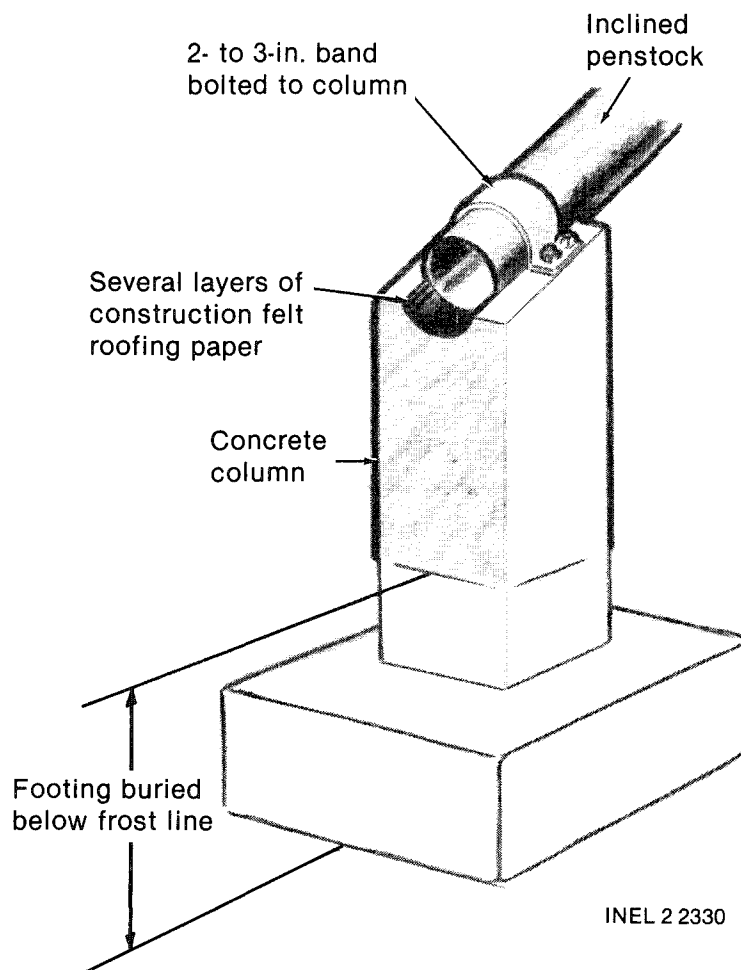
Typical concrete support saddle for above-ground piping.
